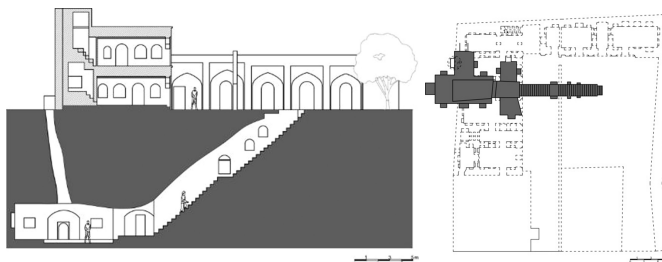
Persian house with *Shavadoon* – section and plan. Hazbei et al., 2015
